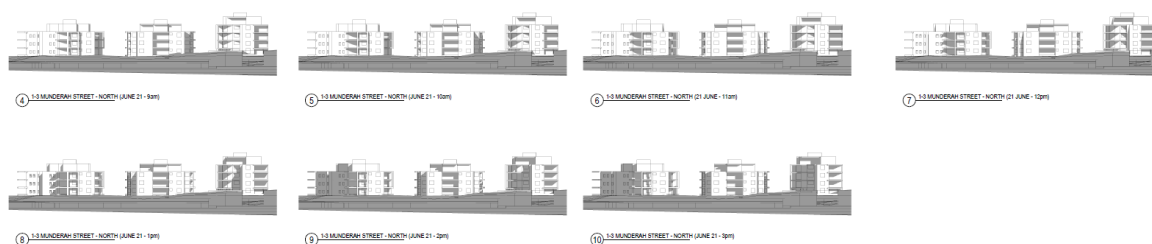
Existing solar impacts 21 June on 1-3 Munderah Street (North)
